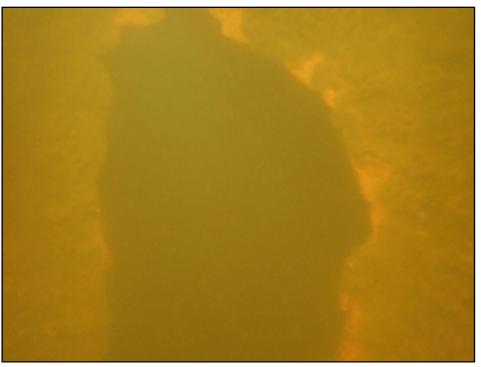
Typical sheet pile hole with 3'-0"+ void behind (Top portion of 5'-0" tall hole).
